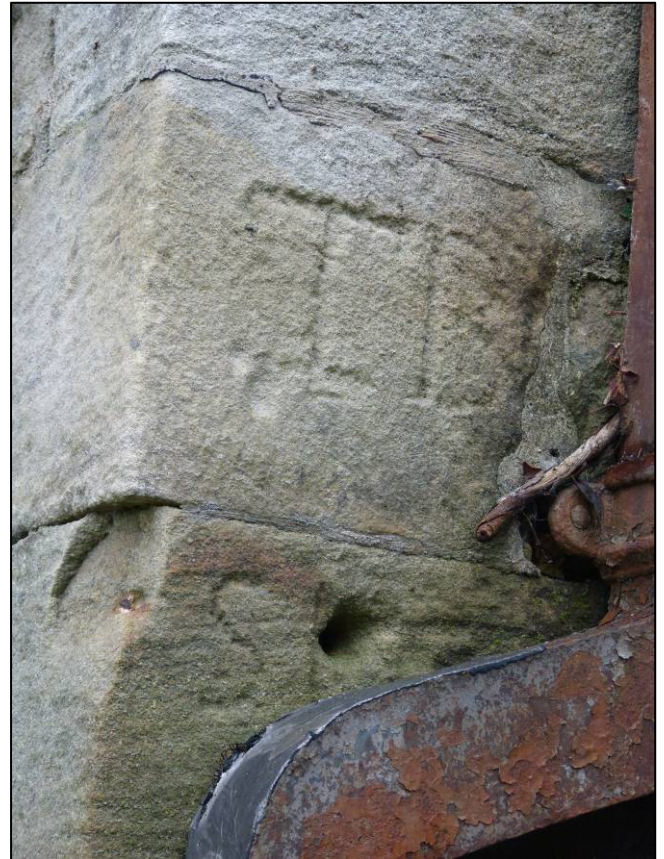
Tower, graffiti on south-east corner, looking W (photo 1/160).
